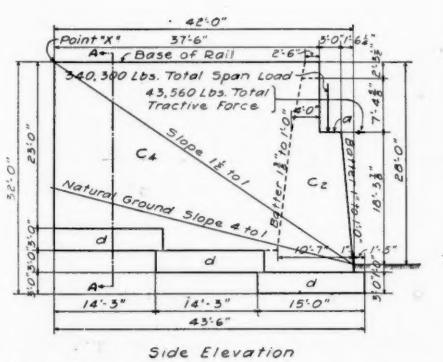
Type B; Plain Concrete U Abutment, Filled.
